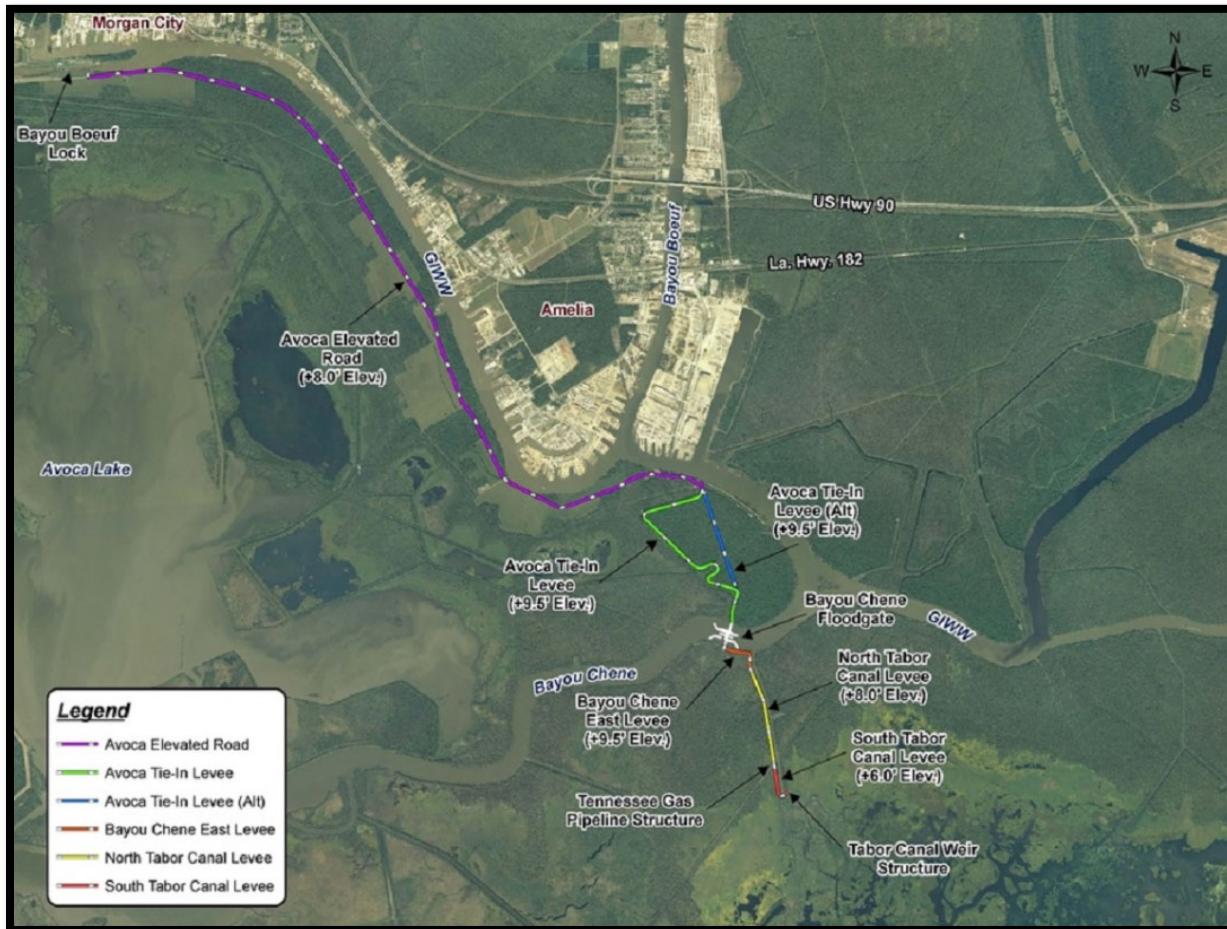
BAYOU CHENE FLOOD PROTECTION STRUCTURE
